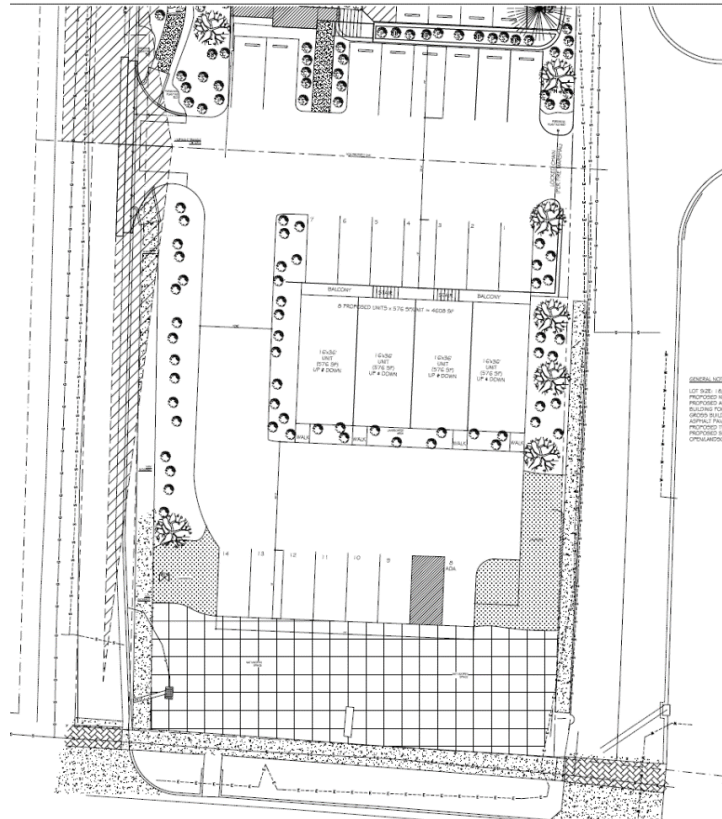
Proposed general site design layout with shared access to the northwest with adjacent development at 62 County Road 135, and two additional frontages: State Highway 6 & 24 to the south and a private access road to the east.
